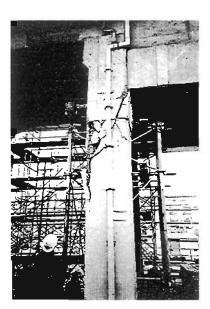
Hanshin Expressway to the west of Kobe centre: Shear-flexure failure at underside of column crosshead - lack of confinement
